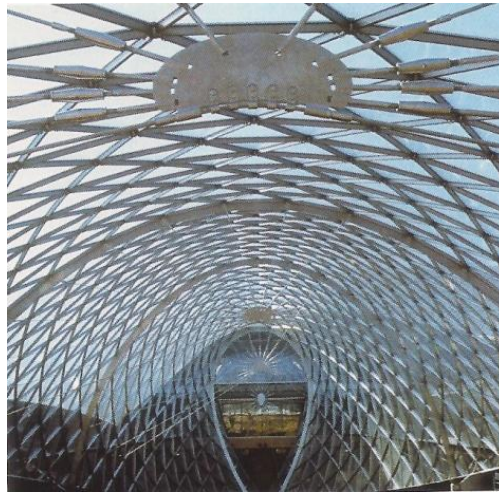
50. Usage of stiffening tension rods, DZ Bank Building, Berlin, Germany, Frank Gehry & Associates (Source: Schlaich, 2008)
